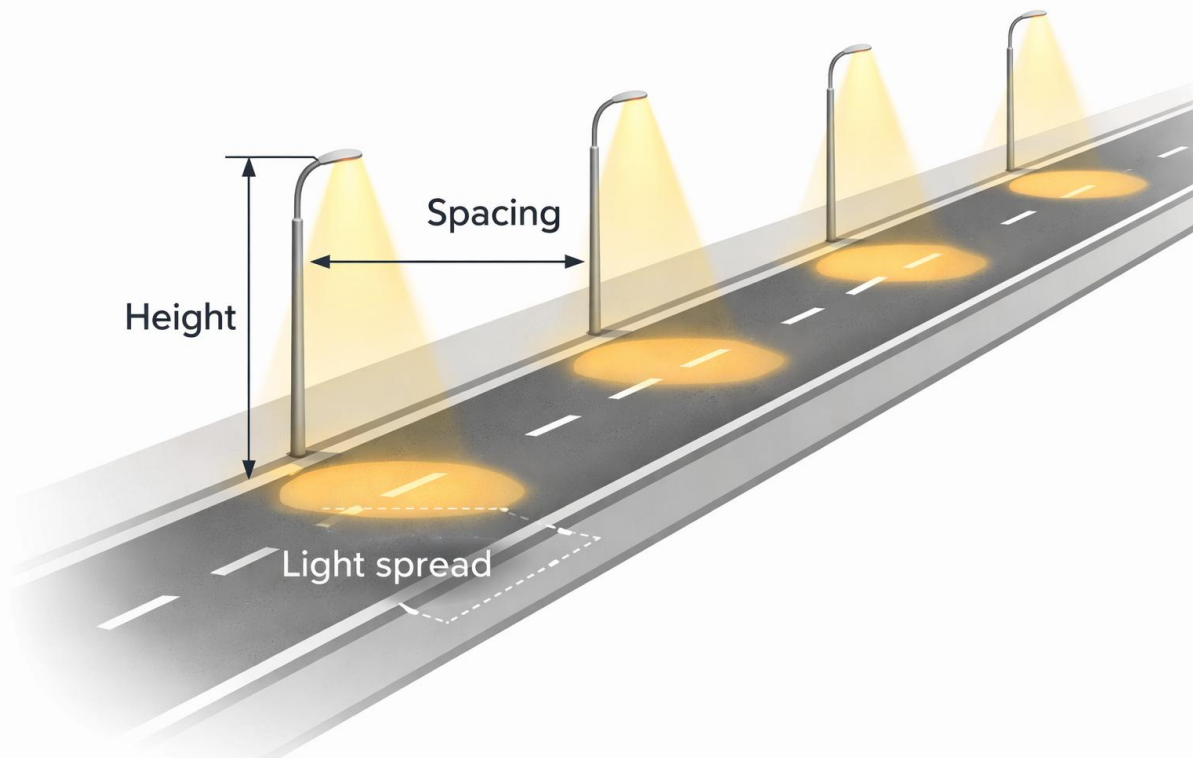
Simple road layout showing poles, height, spacing, and light spread.
